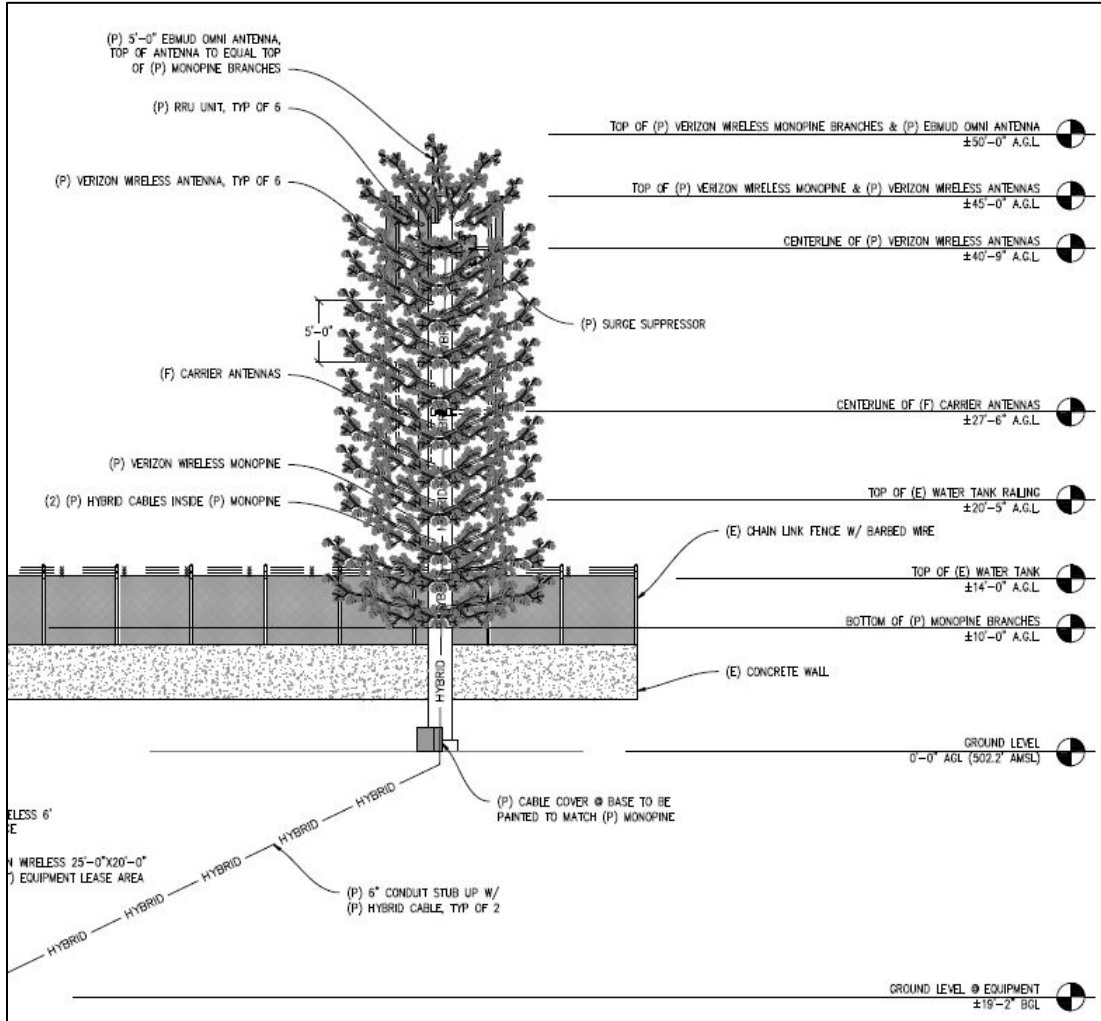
Overall height and design of Monopine (Elevation view; Source: Plans Page A5).
